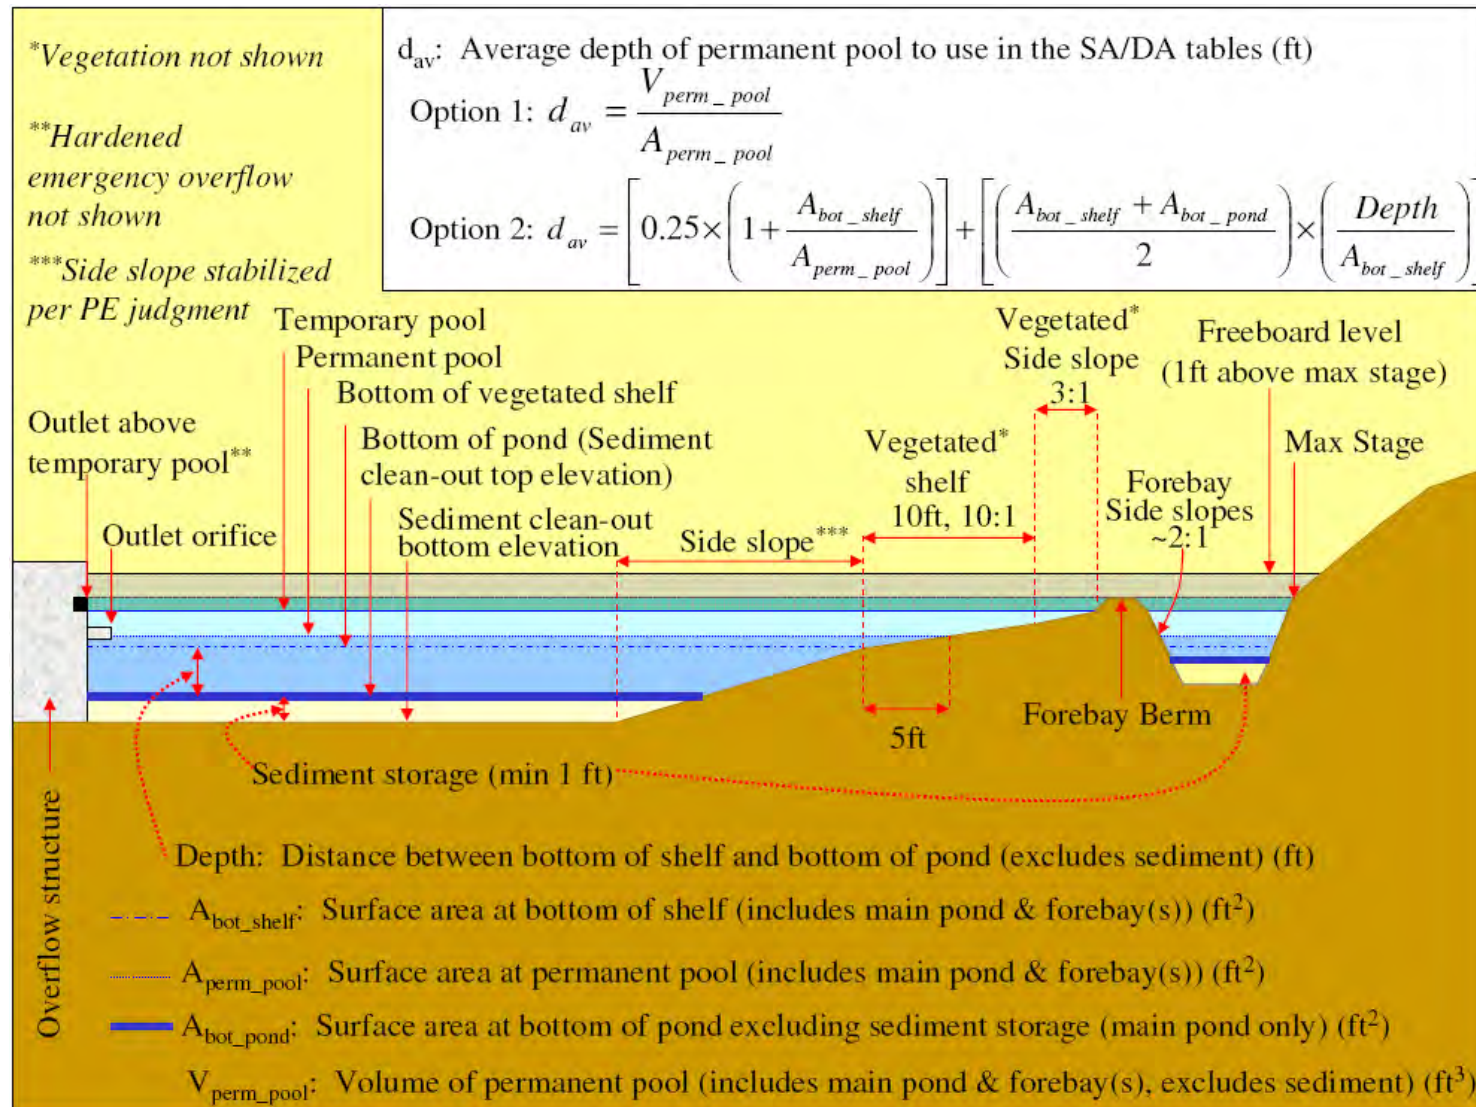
Basic Wet Detention Basin Elements: Cross Section
